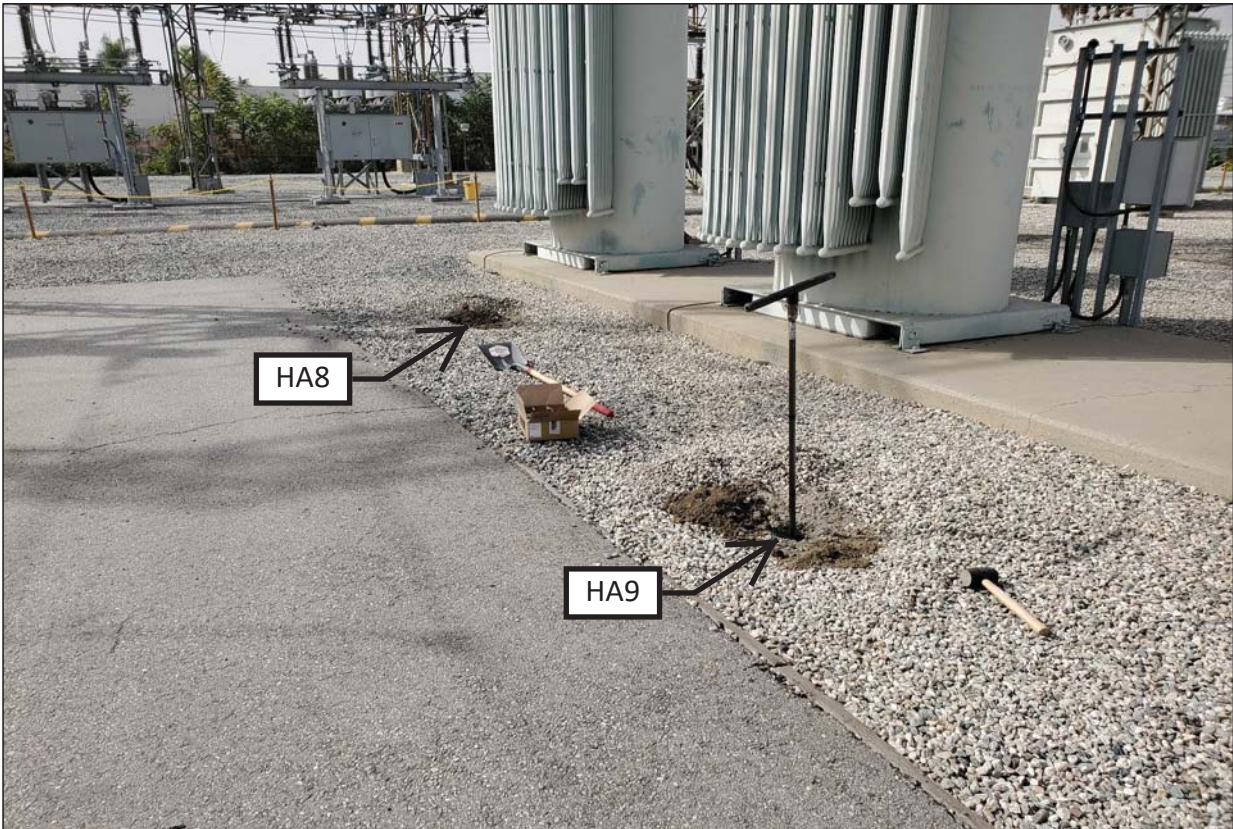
HAND AUGER LOCATIONS HA8 AND HA9
